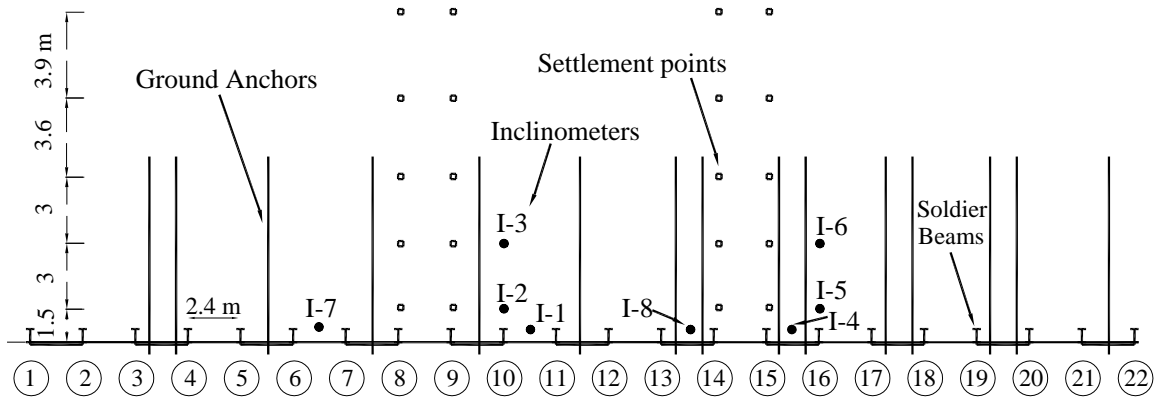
Plan view of the wall (modified after FHWA-RD-98-066)
